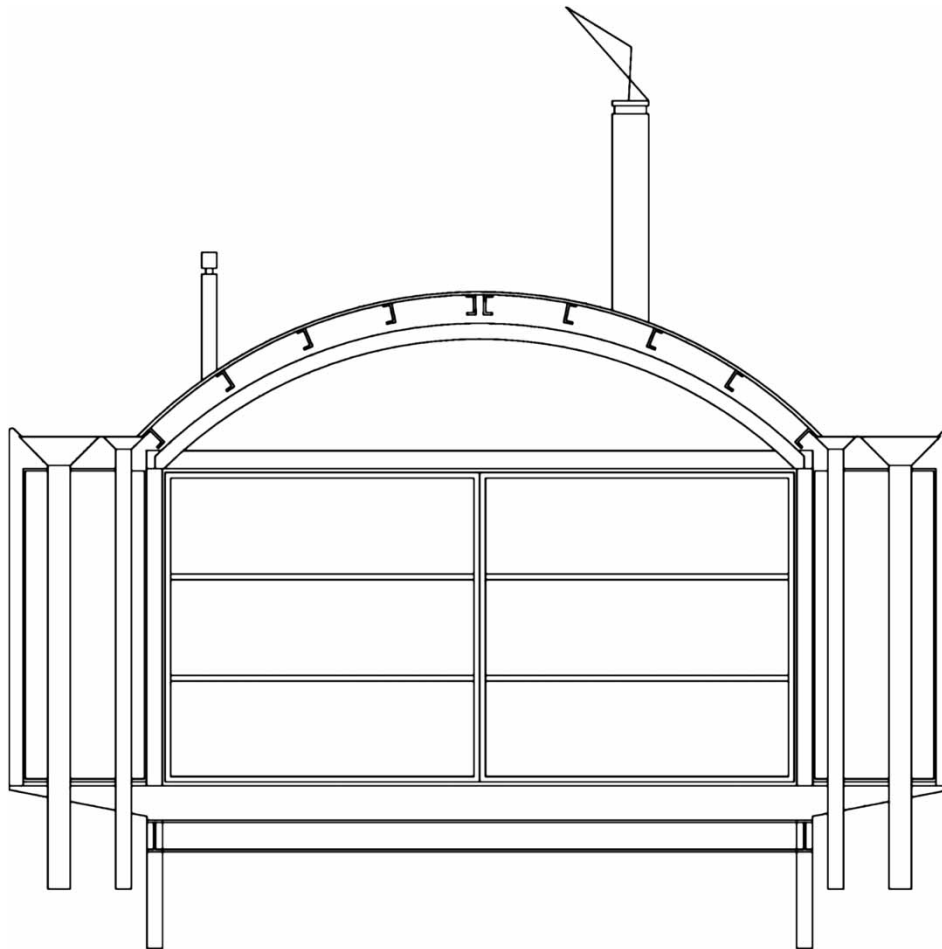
Ball-Eastaway House east elevation; opaque elevation.
